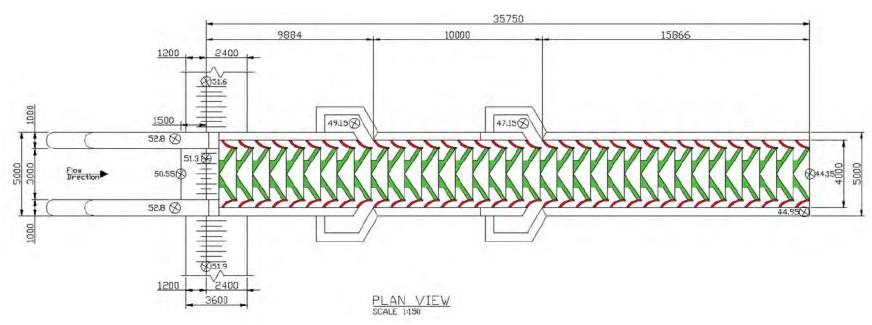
Plan layout of the proposed fishway-canoe chute with 1m radius baffles
